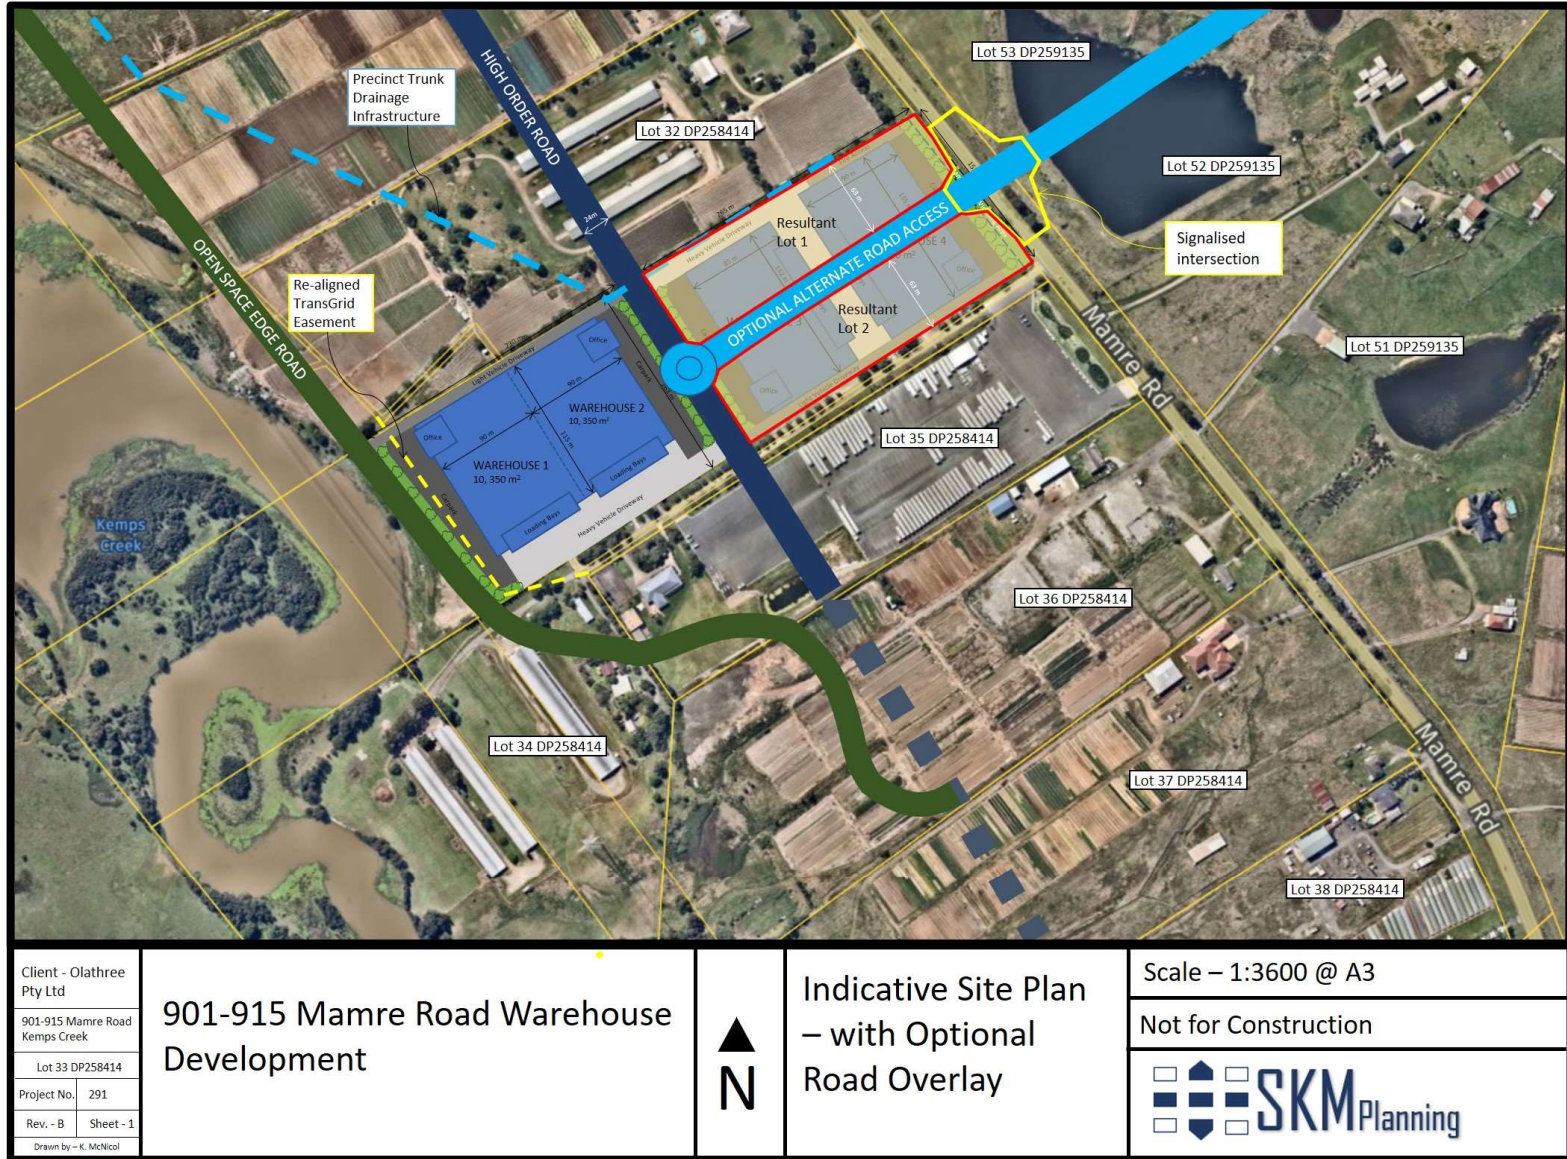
Indicative Optimal Site Plan with Optional Alternate Road Overlay
